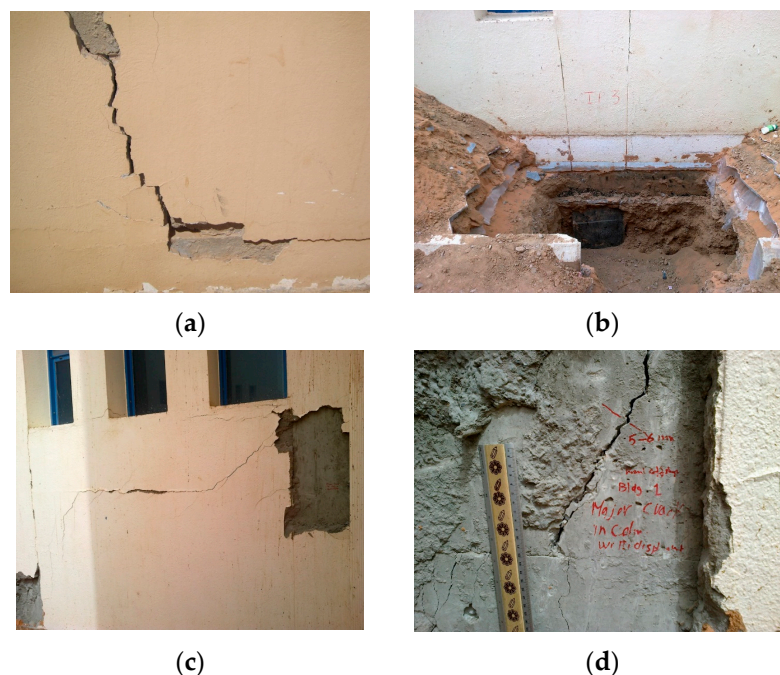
Examples of damage in lightweight structures constructed on expansive soils: (a) Cracks in a wall (Private building in Al Masif, Tabuk, Saudia Arabia), (b) Cracks in a ground beam (Government building in Al Masif, Tabuk, Saudia Arabia), (c) Cracks in a wall (Government building in Al Masif, Tabuk, Saudia Arabia), (d) Cracks in a column (Government building in Al Masif, Tabuk, Saudia Arabia).
